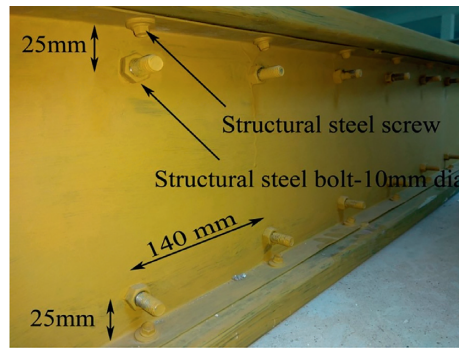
Longitudinal profile indicating the location of fasteners.
